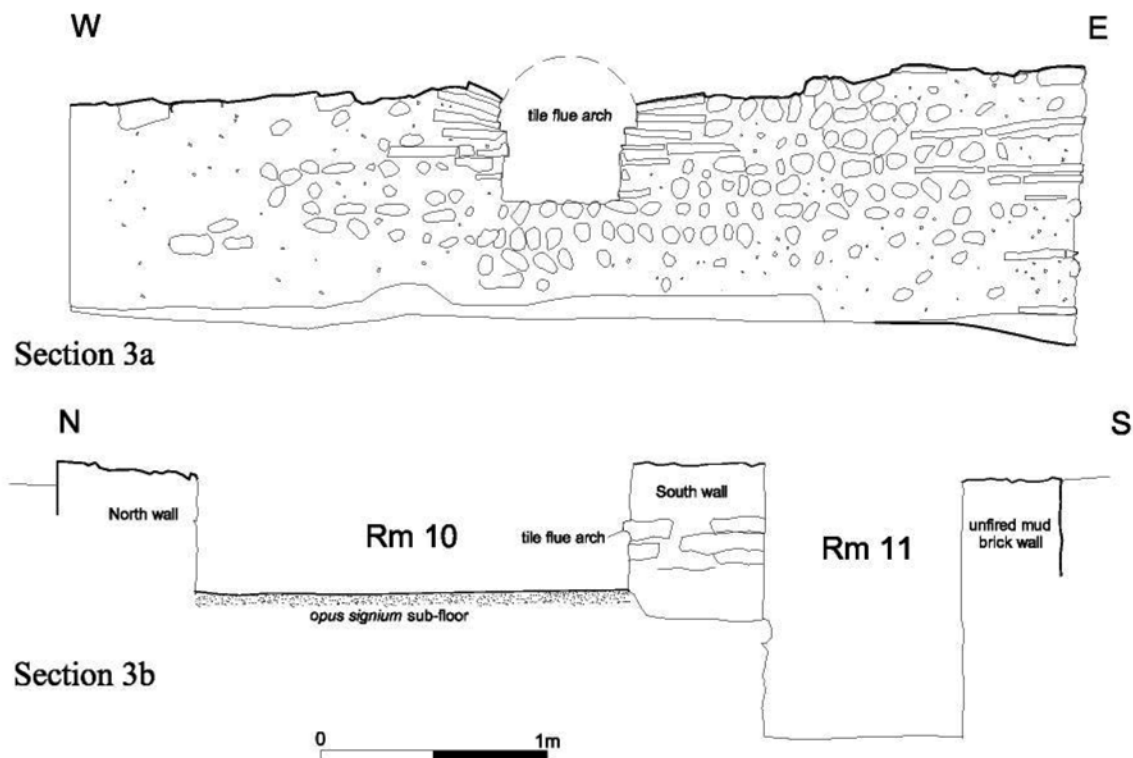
a) External elevation of south wall of Room 10; b) Section through Rooms 10 and 11.
